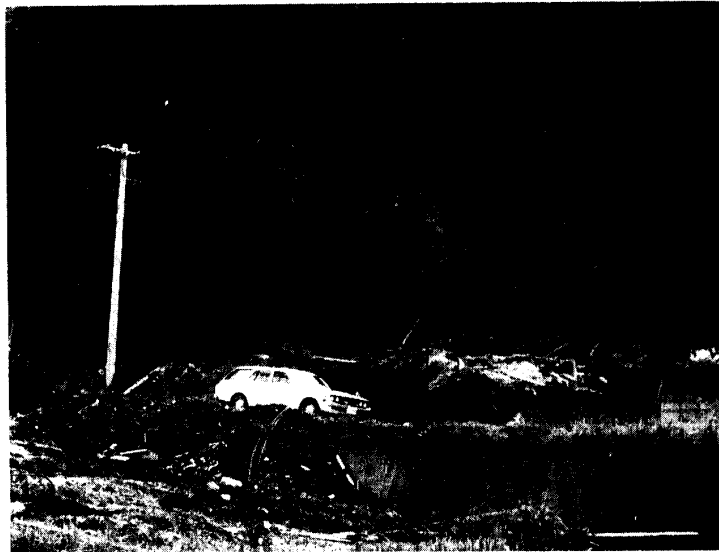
Slope failure due to piping in the slope of decomposed Shirasu.
